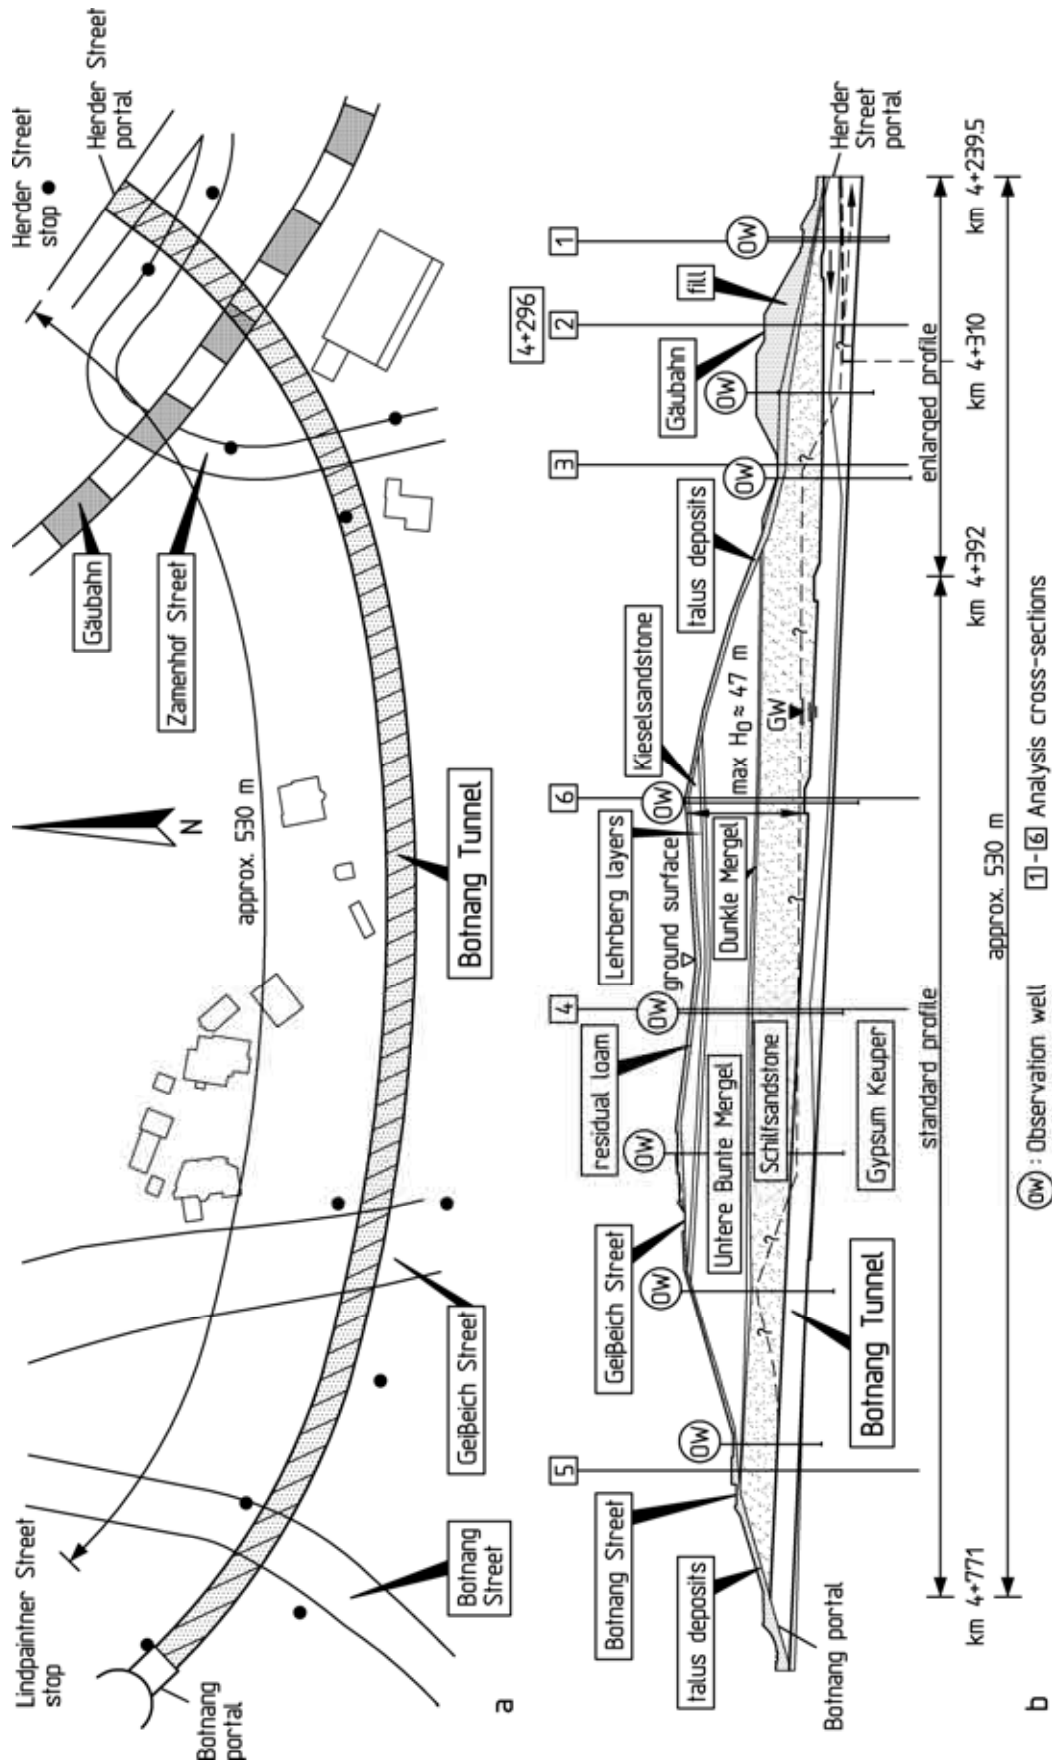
City railway tunnel to Botnang: a) Site plan; b) longitudinal section with ground profile
